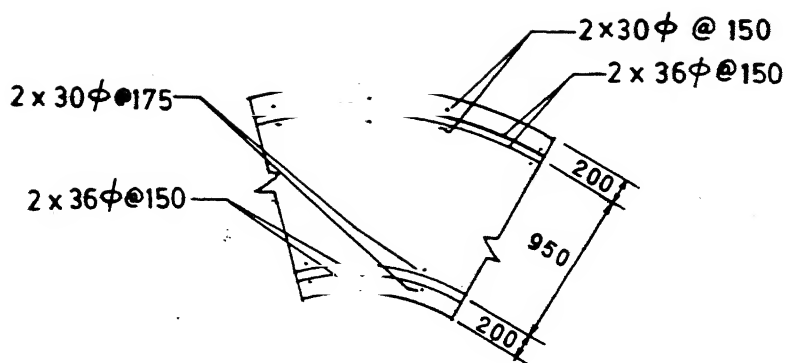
REINFORCEMENT DETAILS OF THE CYLINDRICAL SHELL
